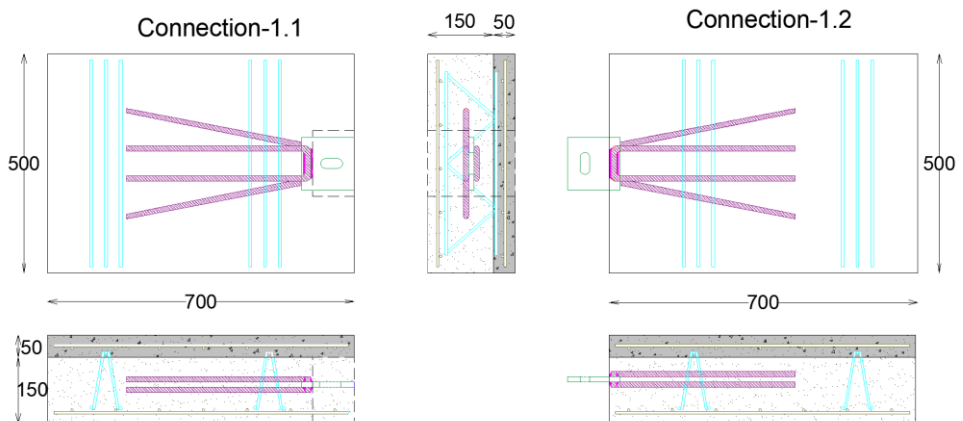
Geometry of the tested specimen – Connection-1 (dimensions in mm).
